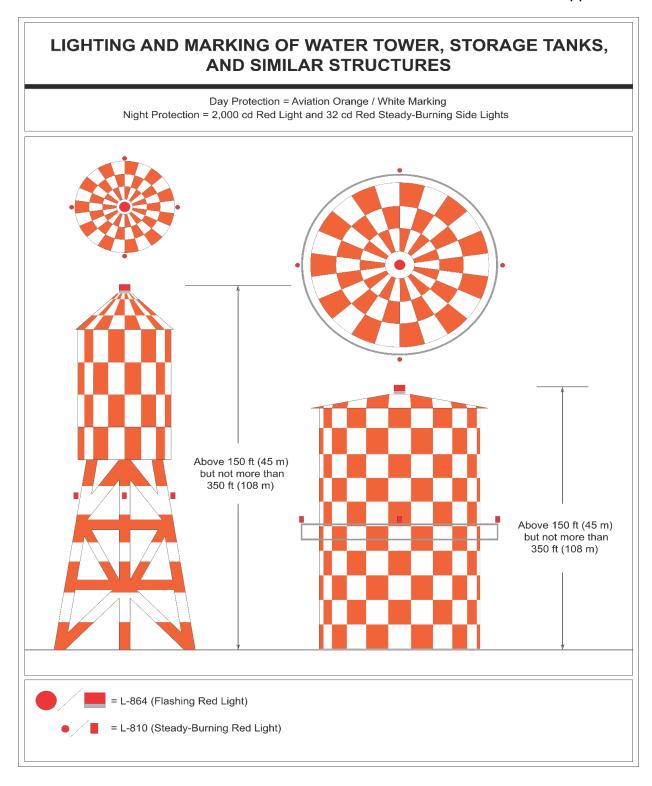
Marking and Lighting of Water Towers, Storage Tanks, and Similar Structures
